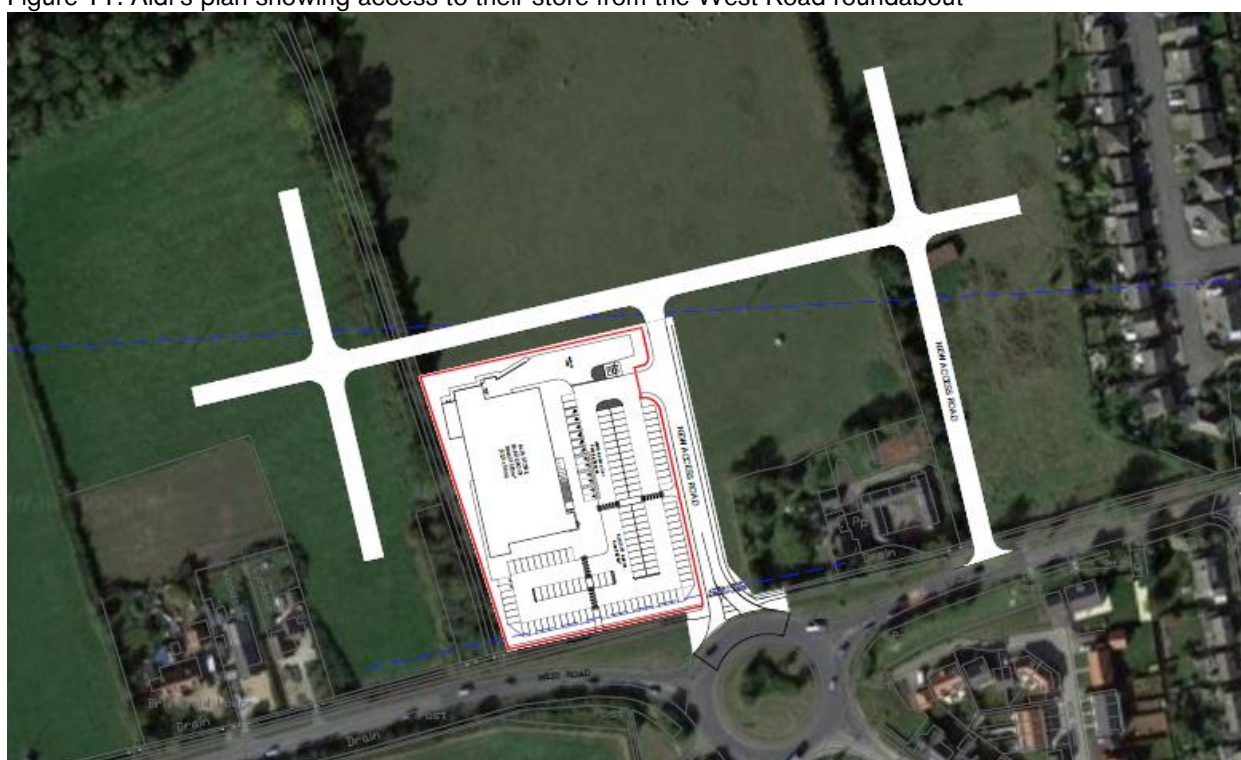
Aldi's plan showing access to their store and a network of roads serving the residual land
